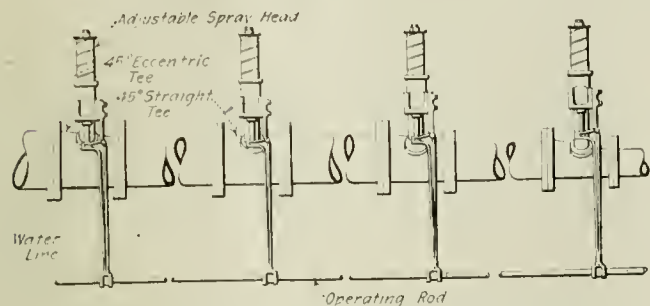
ARRANGEMENT OF THE OPERATING ROD
